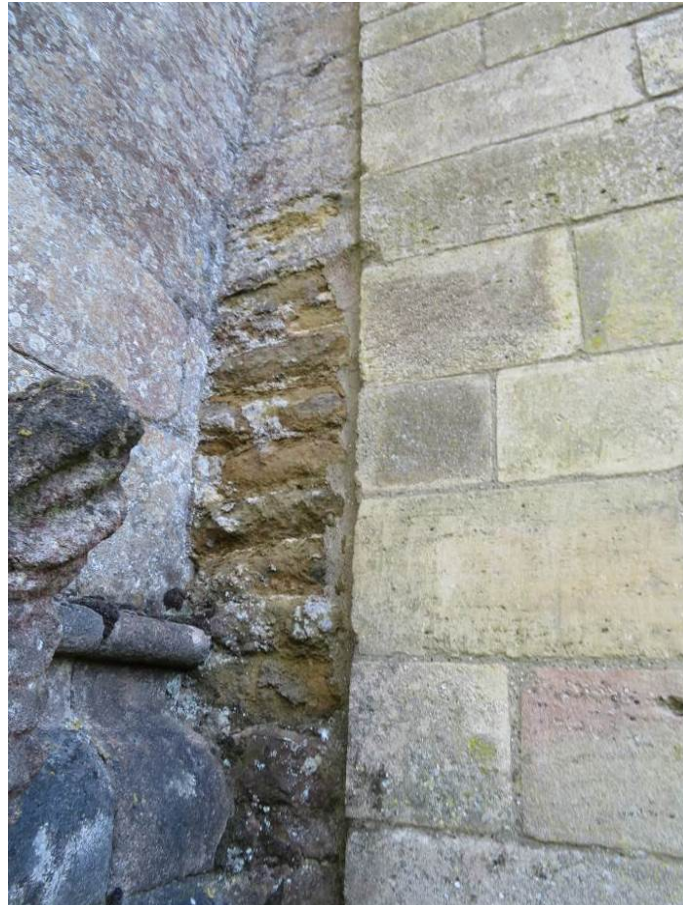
Ironstone re-building over limestone to porch with levelling course highlighted
